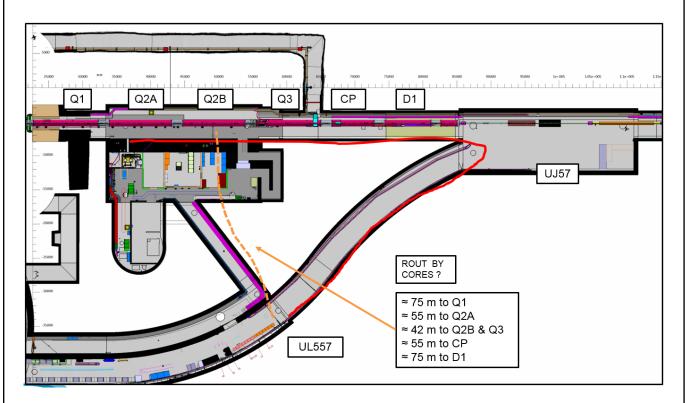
Position of the equipment and draft of the cabling if layout is through cores, option 2
